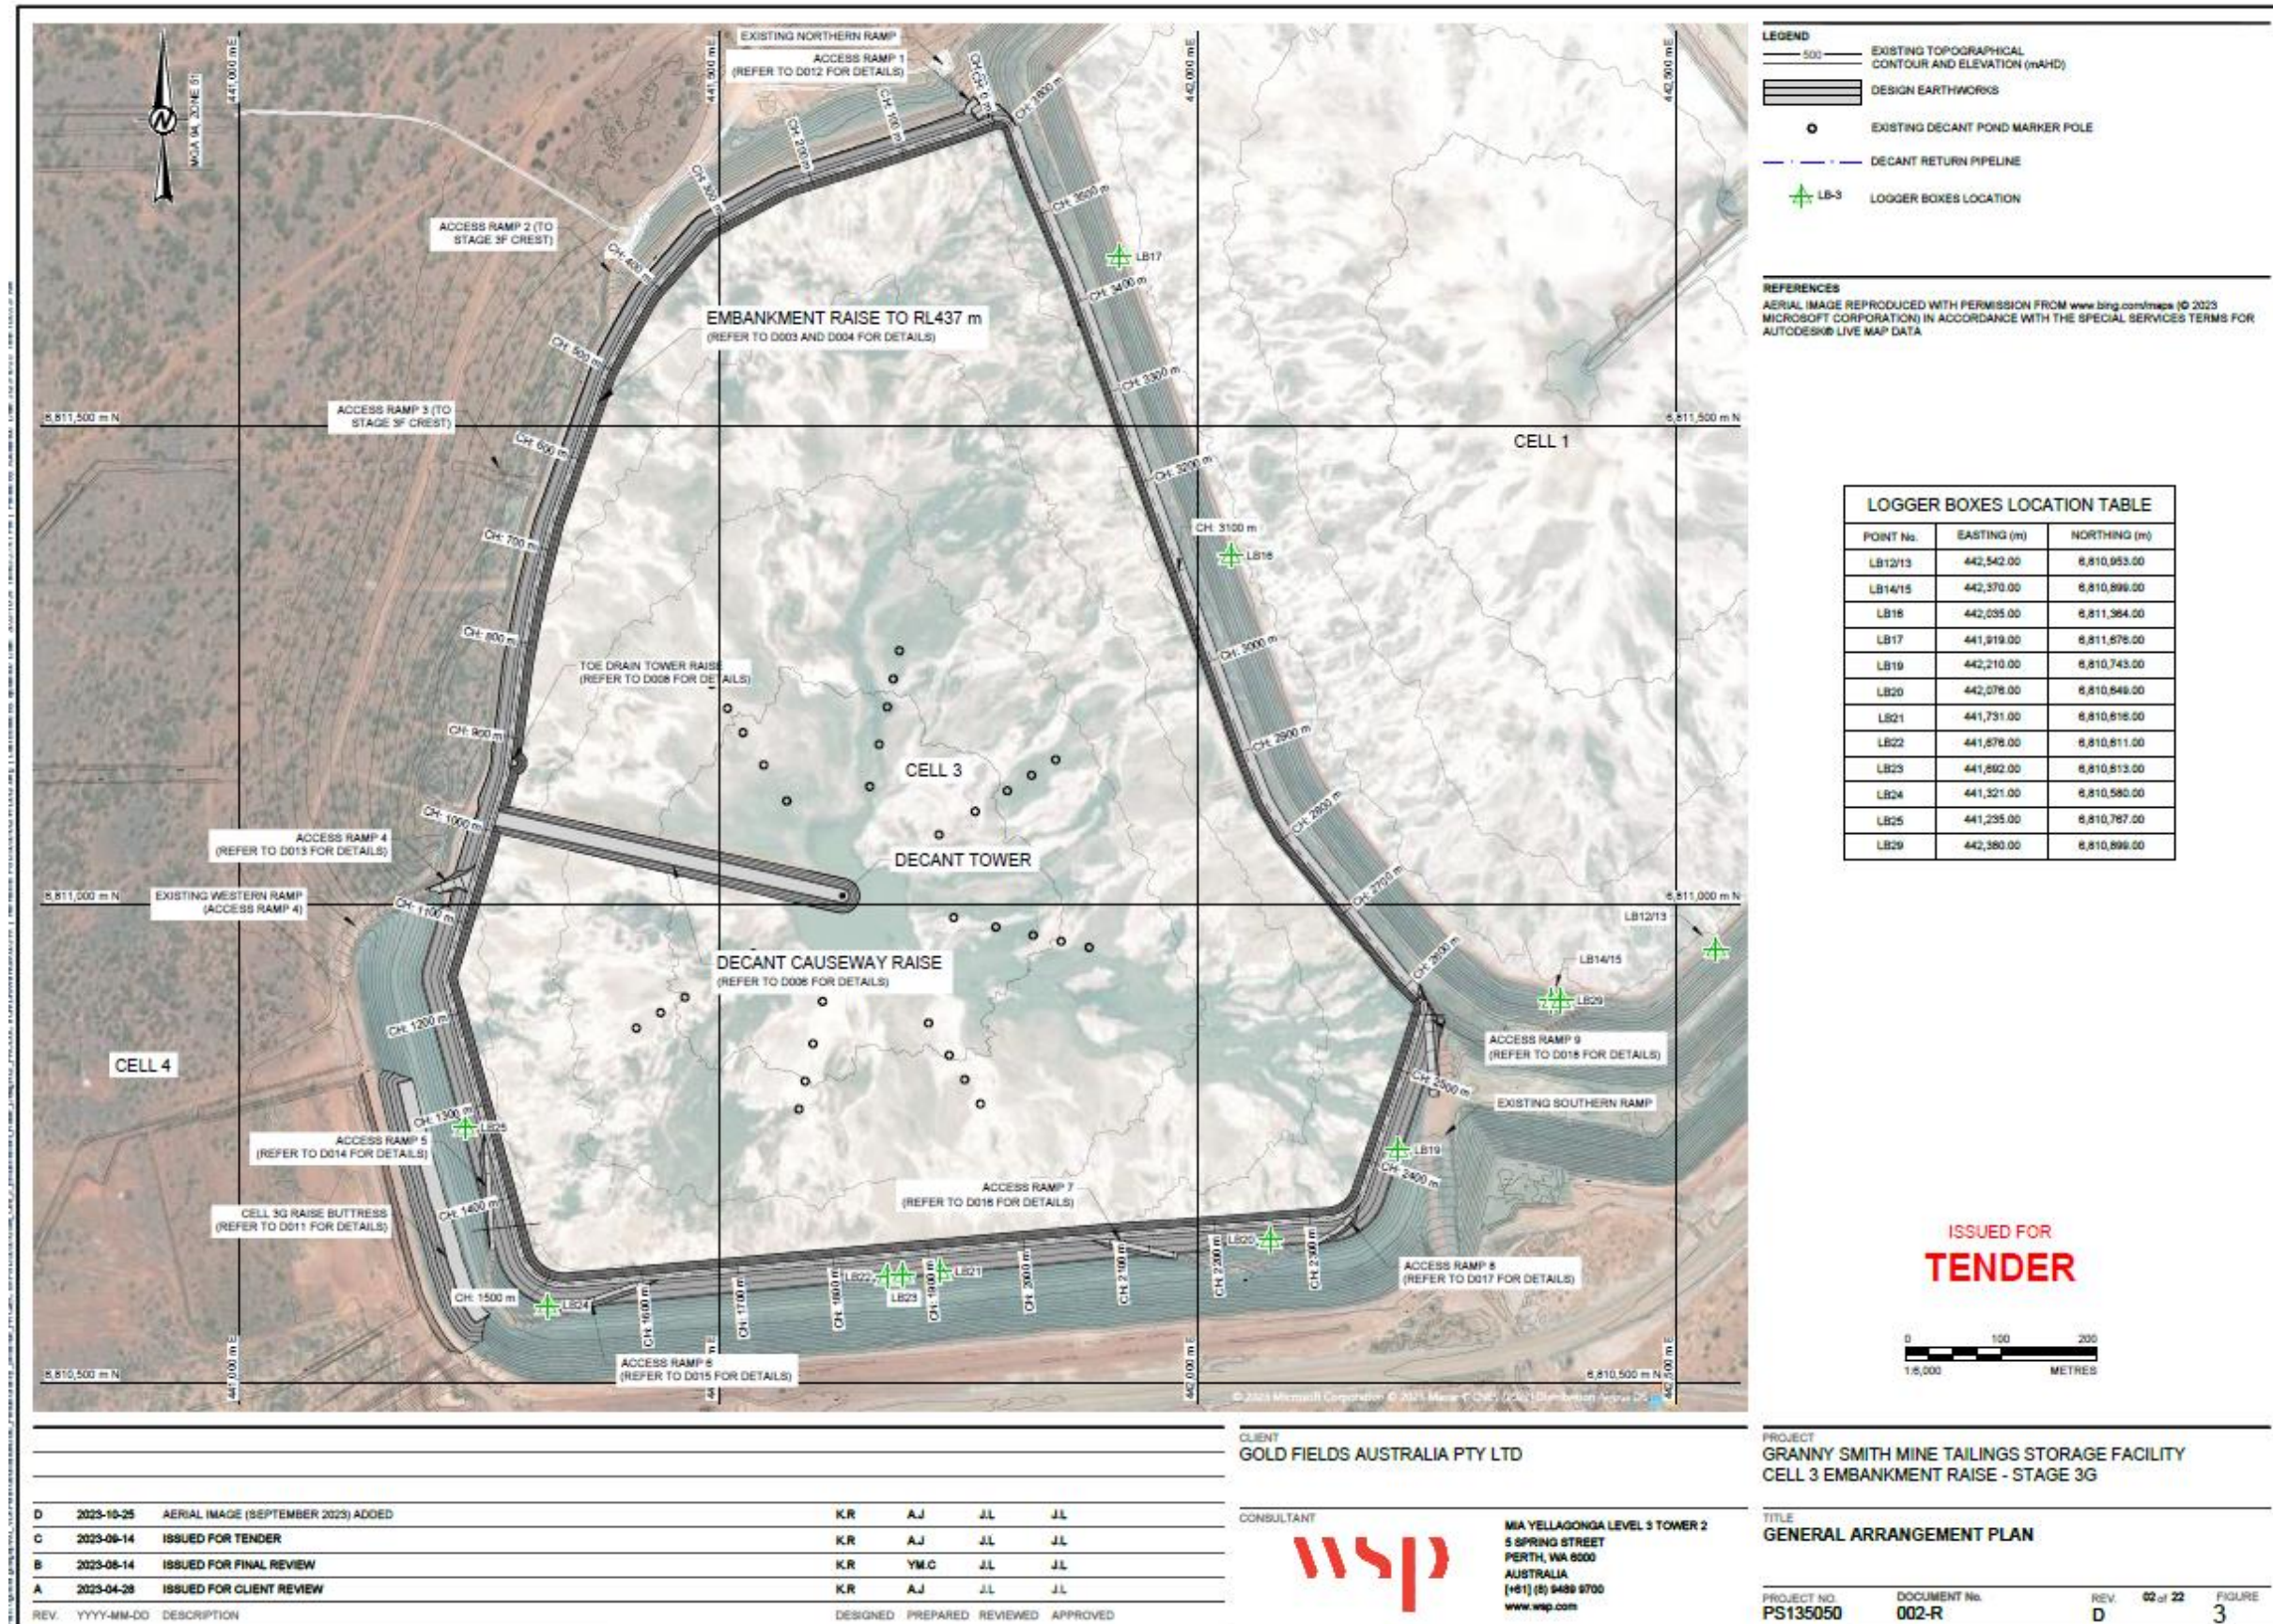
TSF 3 stage 3G lift infrastructure location plan
